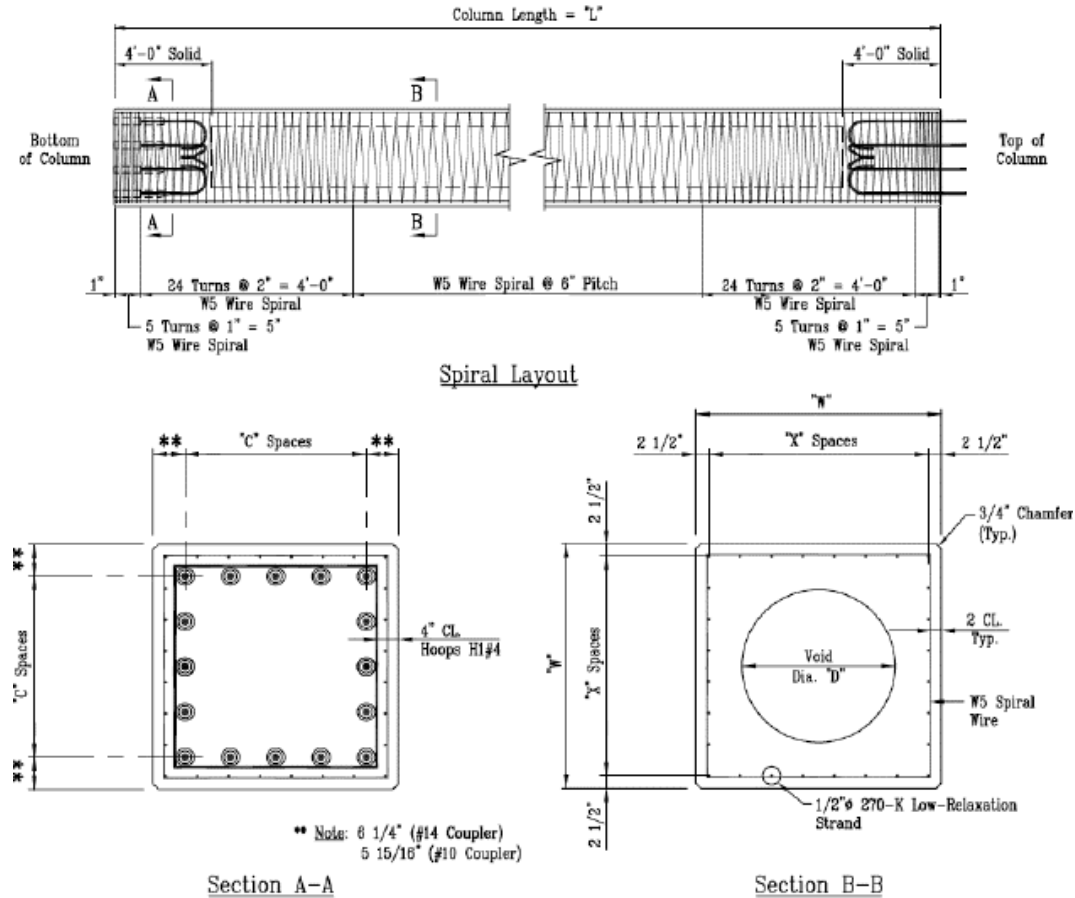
Precast column design proposed by Fouad et al. (2006)
